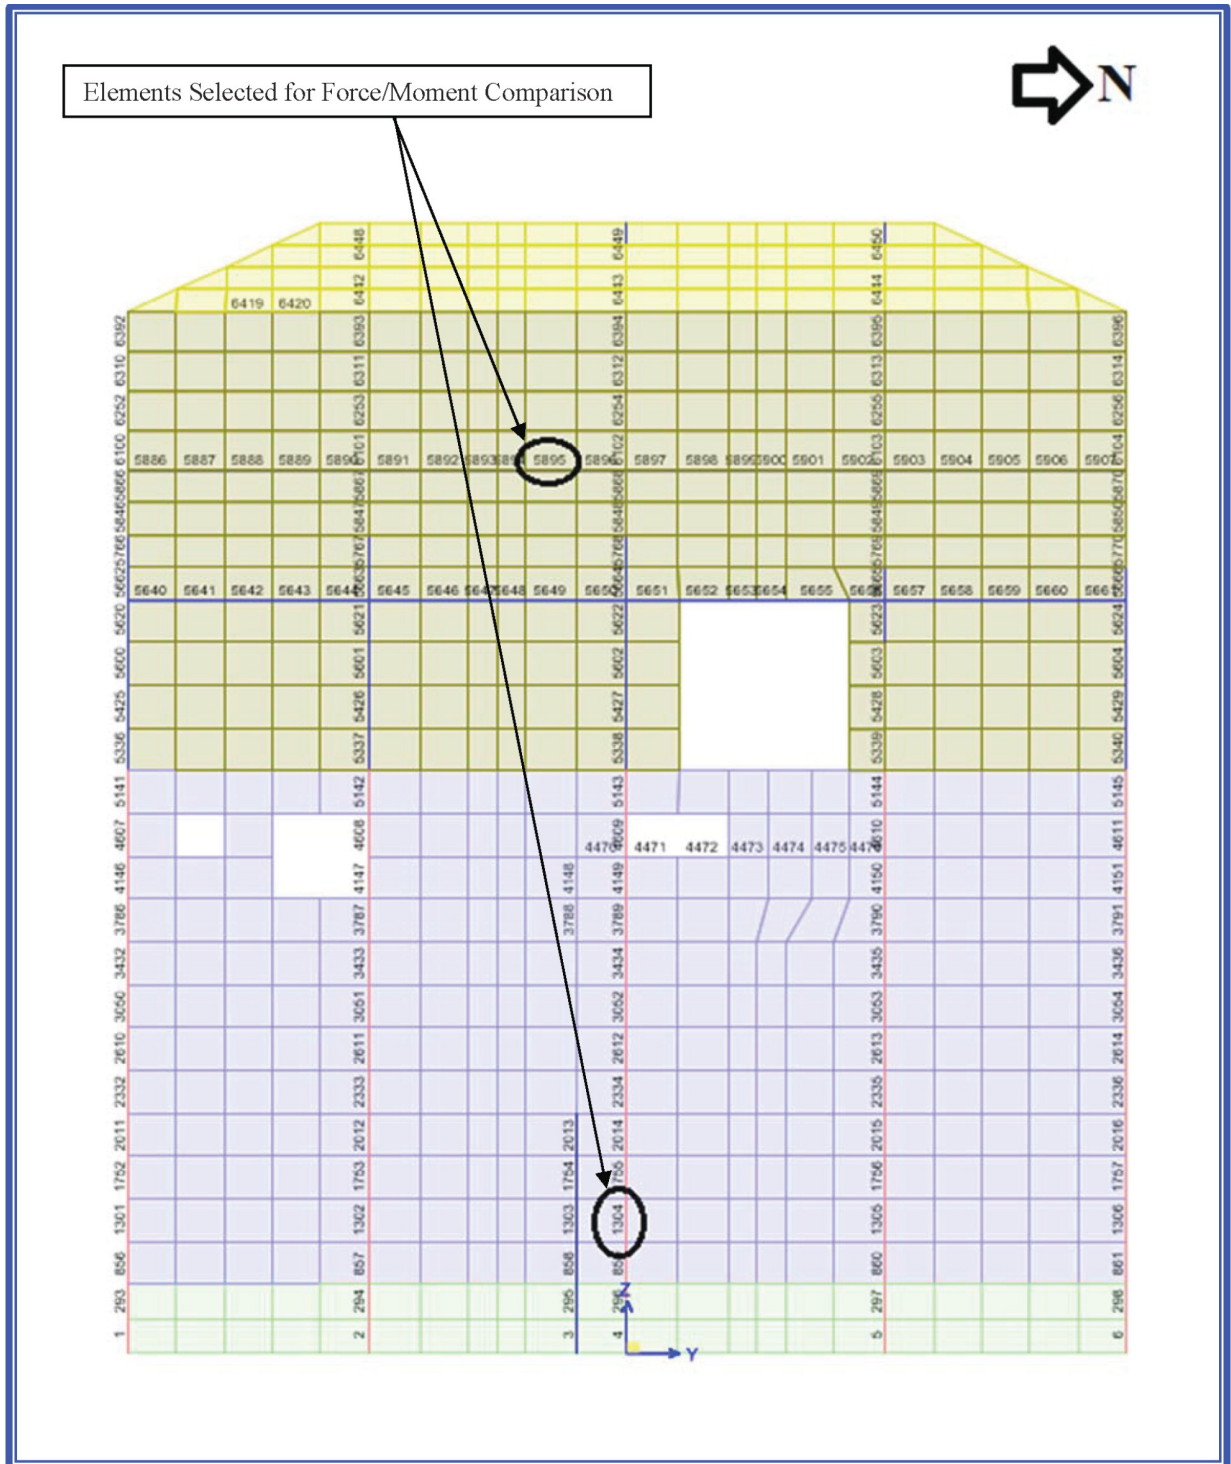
Elevation View of West Wall of RXB Looking West, Showing Location of Beam Elements 1304 and 5895.
